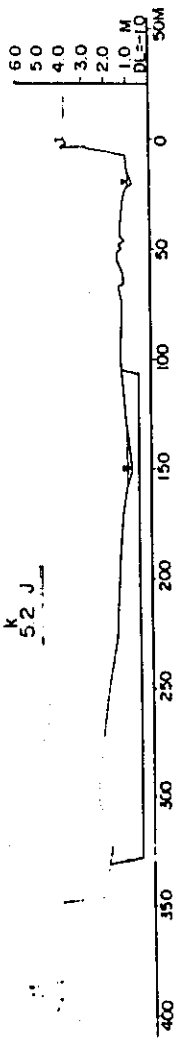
(3) PROPOSED CROSS-SECTIONS FOR URGENT PLAN
